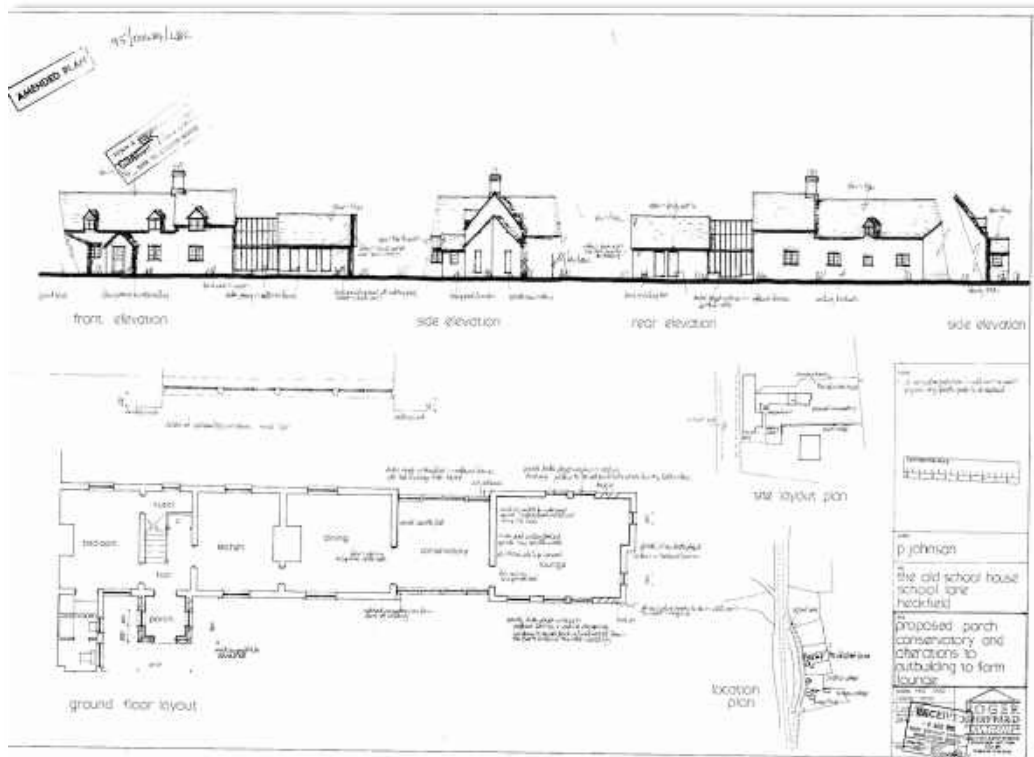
Heckfield Church of England Primary School building, (The School House) planning application – AFTER!
